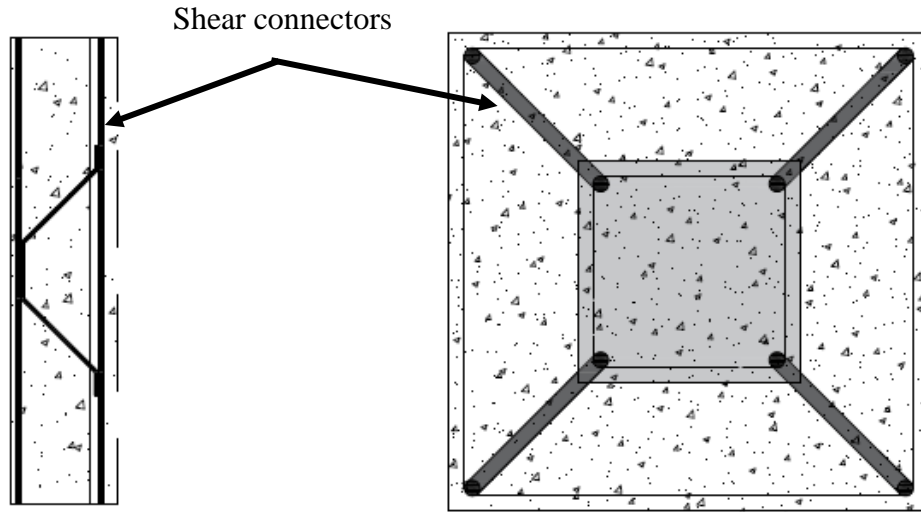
Profile of shear connectors between original column and jacket reinforcement
